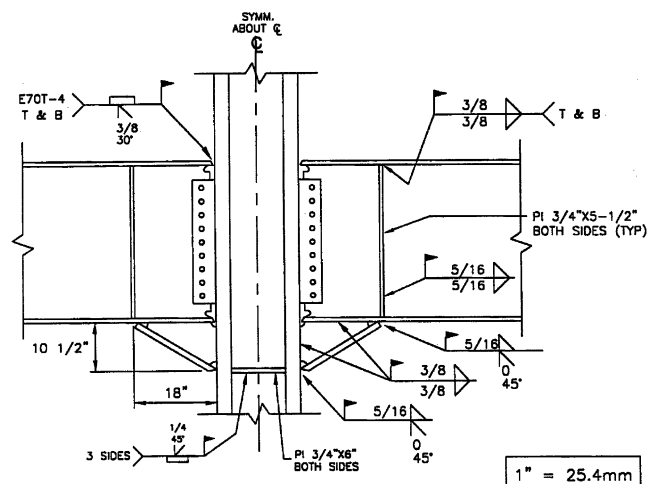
Welded triangular haunch connection (Uang et al. [5]).
